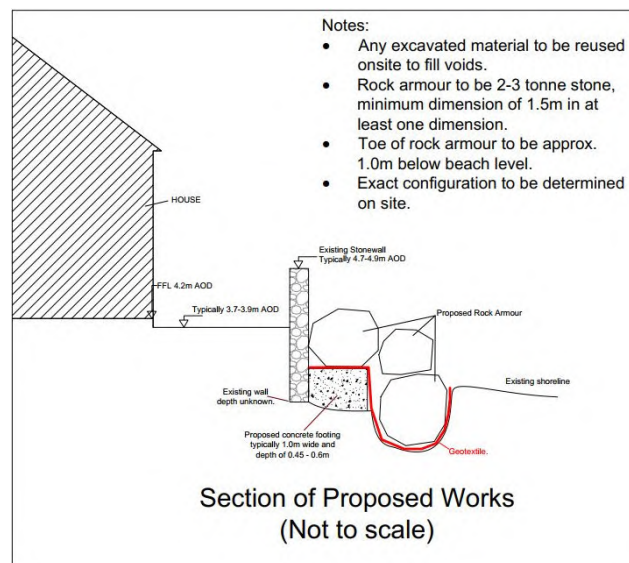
Extract of civil engineering drawings for proposed Coastal Works at Drummullagh showing section through proposed rock armour with concrete footing
